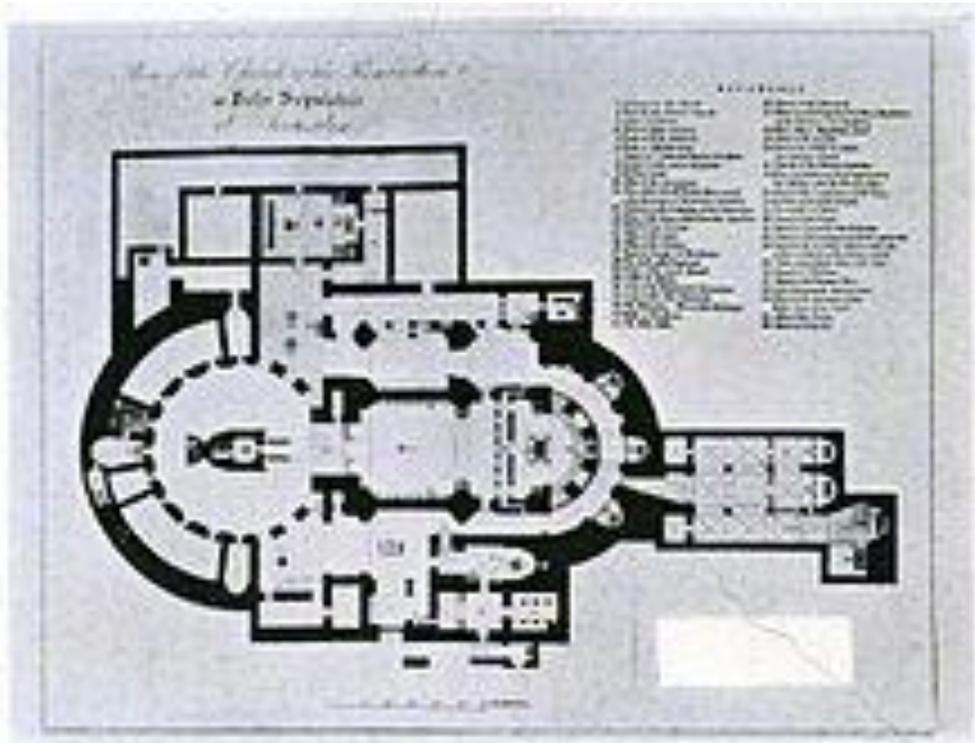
GROUND-PLAN OF THE CHURCH OF THE HOLY SEPULCHRE
